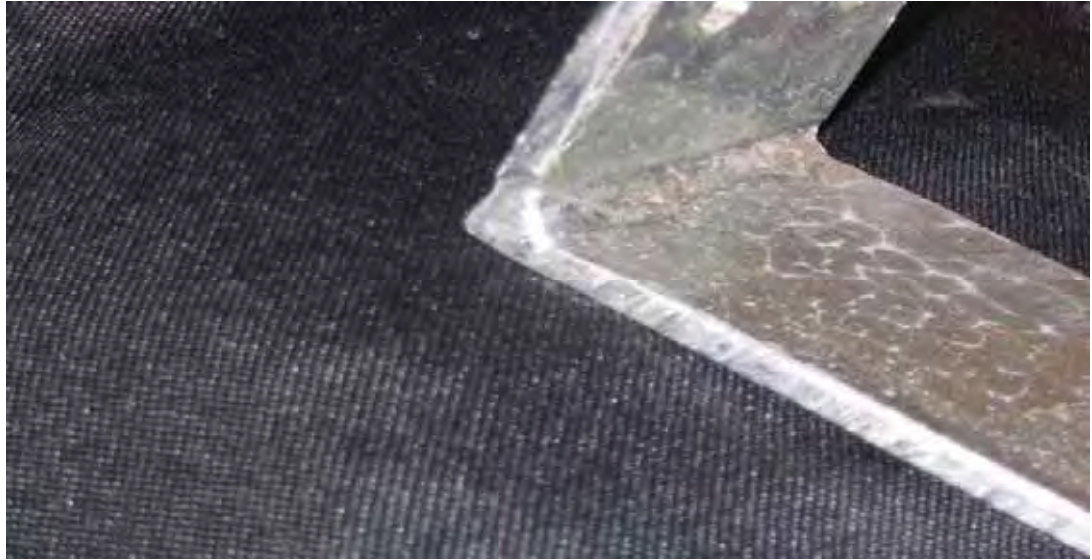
Bracket showing typical butt weld joining two plates together to avoid inherent weakness existing in cracked old radiused brackets, which existed at every mullion section throughout.
